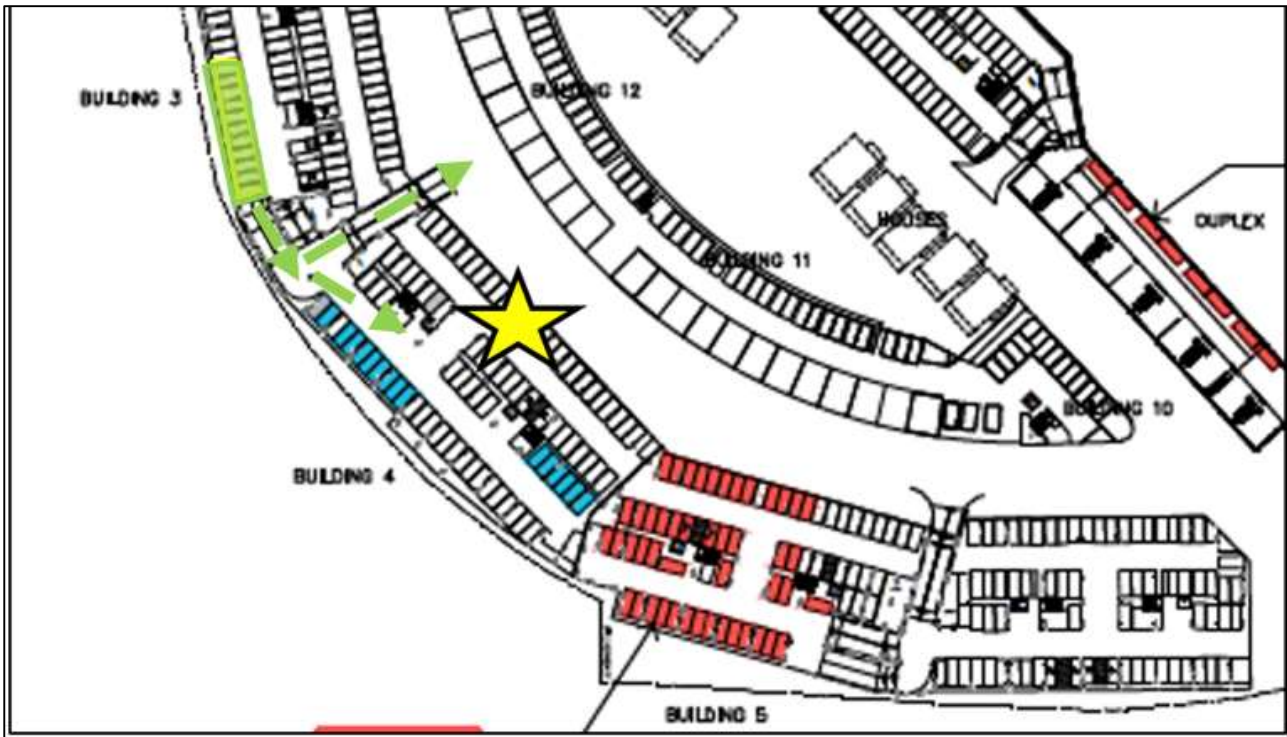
Basement parking plan for facility. Existing staff parking allocated to the facility is outlined in blue. The centre is marked as a start, The proposed new parking spaces and path of travel to the centre is marked in green.
